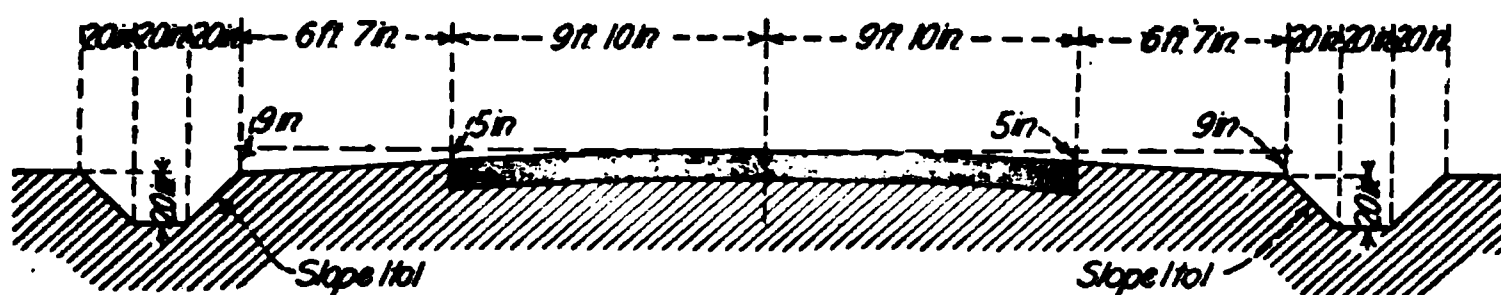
TYPICAL ROAD IN DEPARTMENT OF BAS-RHIN, FRANCE.
